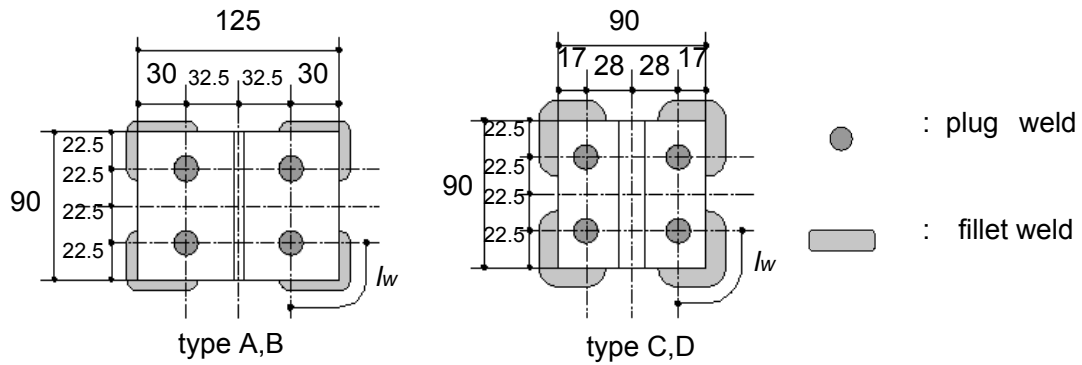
Plug and Fillet Welds of Subassemblage Specimen (unit : mm)
